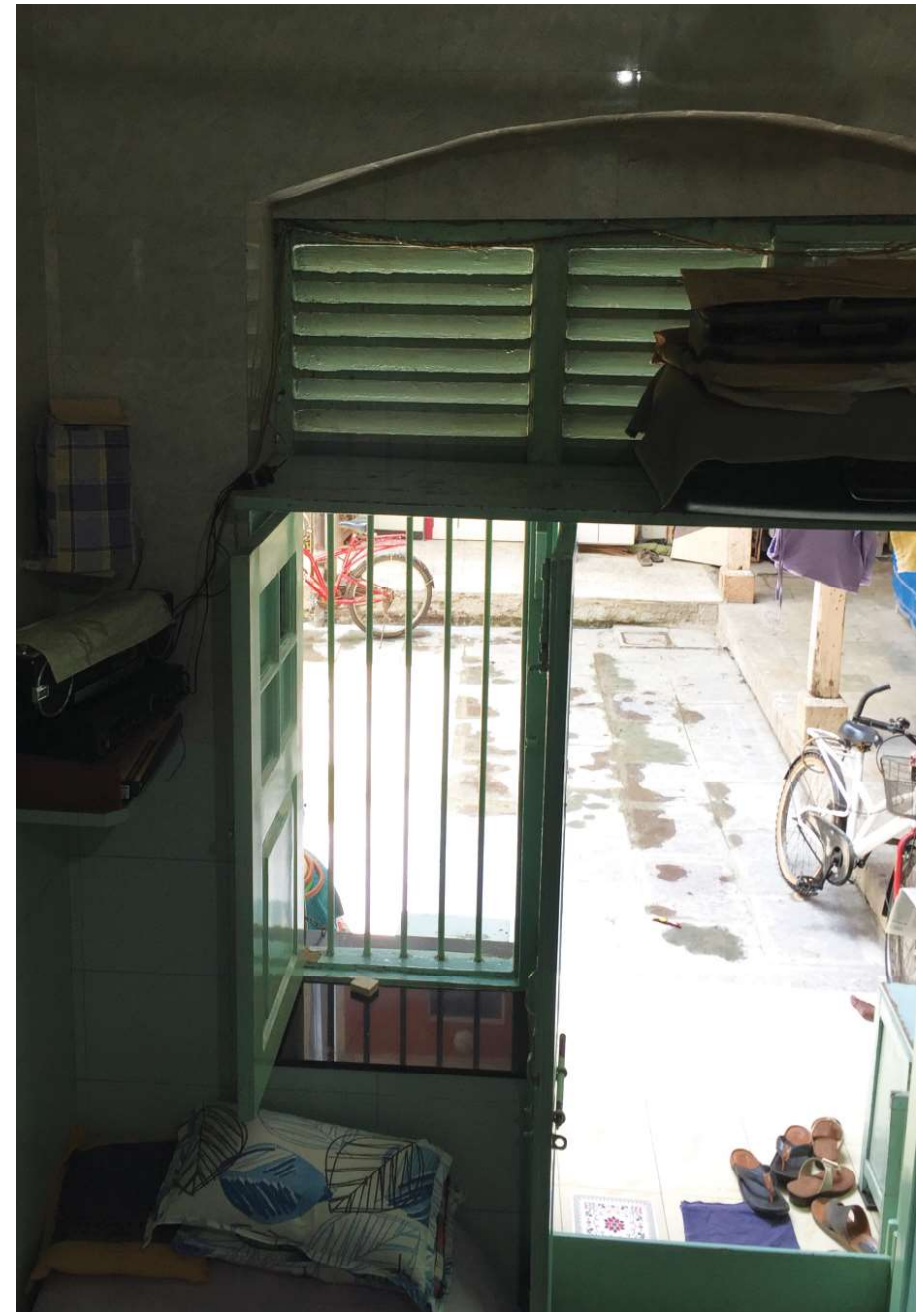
Detail Section B-B' - Door + Window + Ventilator Combo
